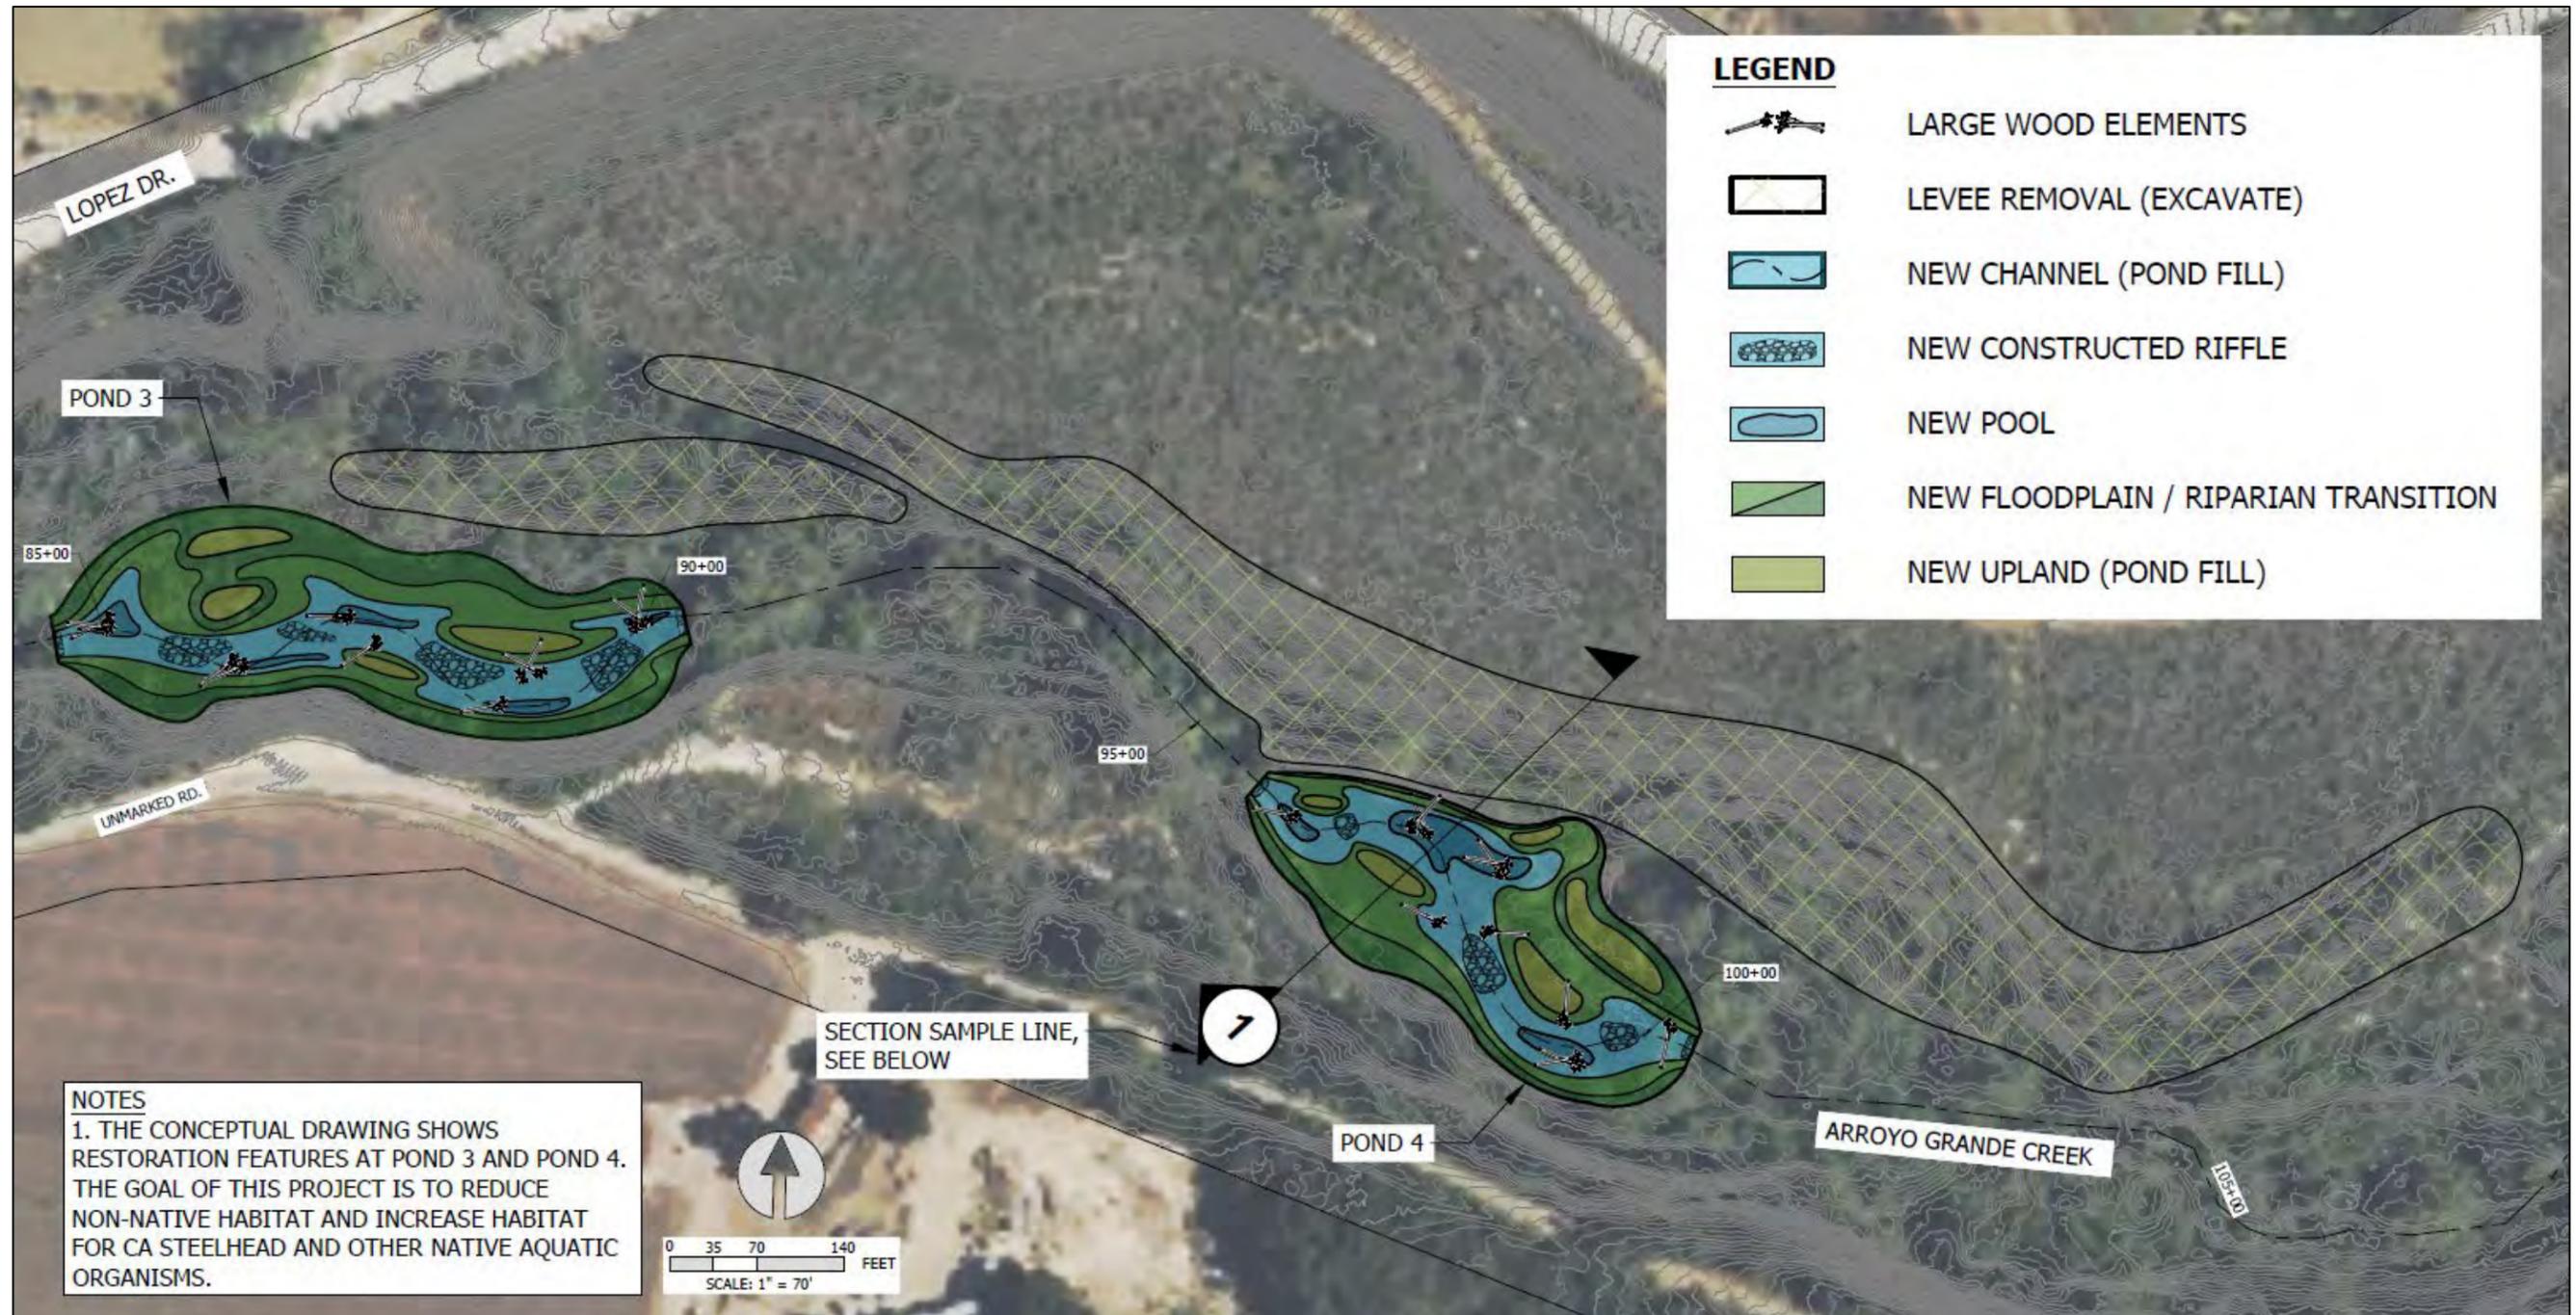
Detail of conceptual Pond Conversion to Stream Habitat - Plan View.
